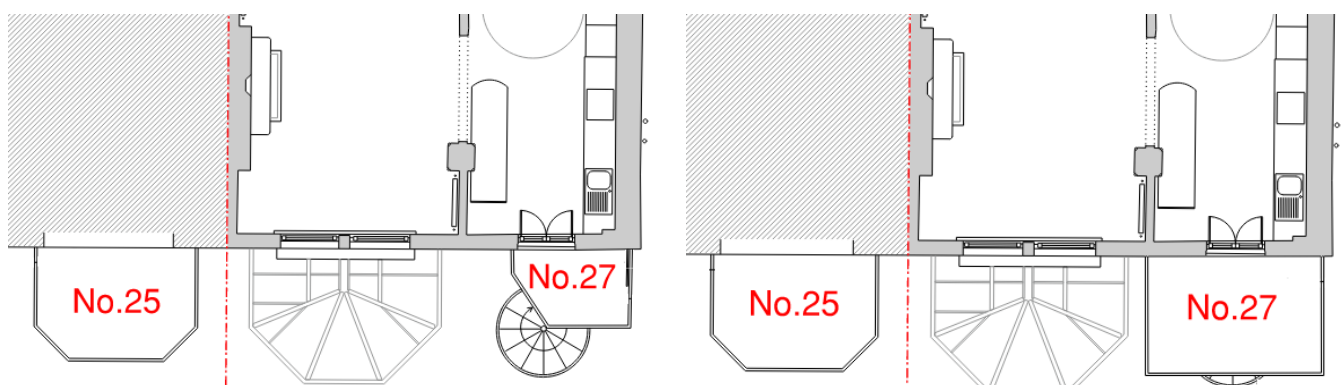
& 4 – existing & proposed rear elevations showing nos.25 & 27 (drawing extracts)
